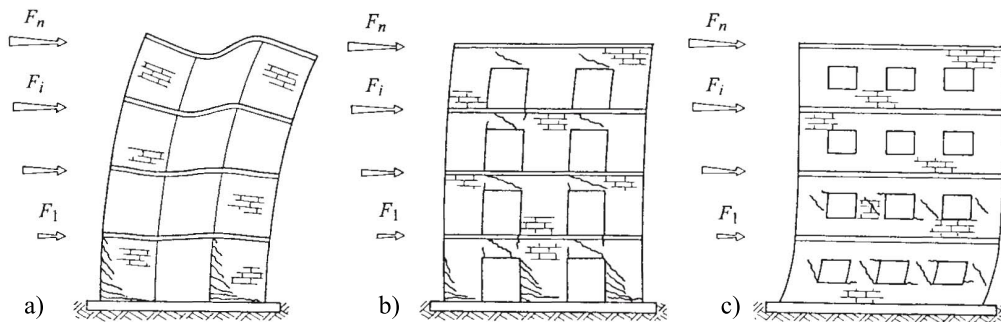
Deformation and crack pattern for three cases of coupled walls a) cantilever walls linked by flexible floor and slabs , b) coupled shear wall with weak spandrels and c) coupled shear wall with weak piers (from [Tom99] p.183)
